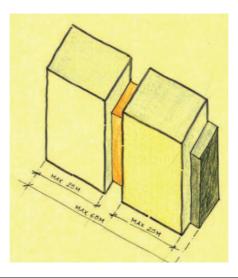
Building Articulation / Maximum Building Length
